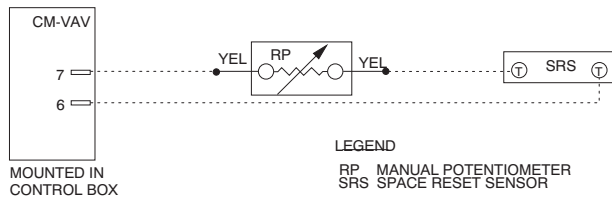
TYPICAL SPACE SENSOR WIRING
